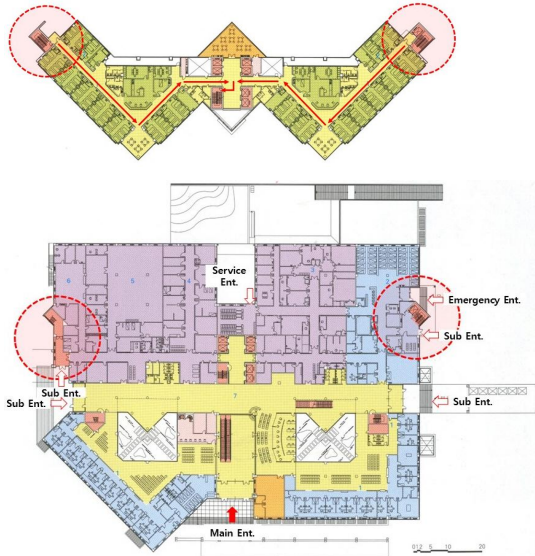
1st Floor Plan and 4th Floor Plan (G-Veterans Hospital)[5]
